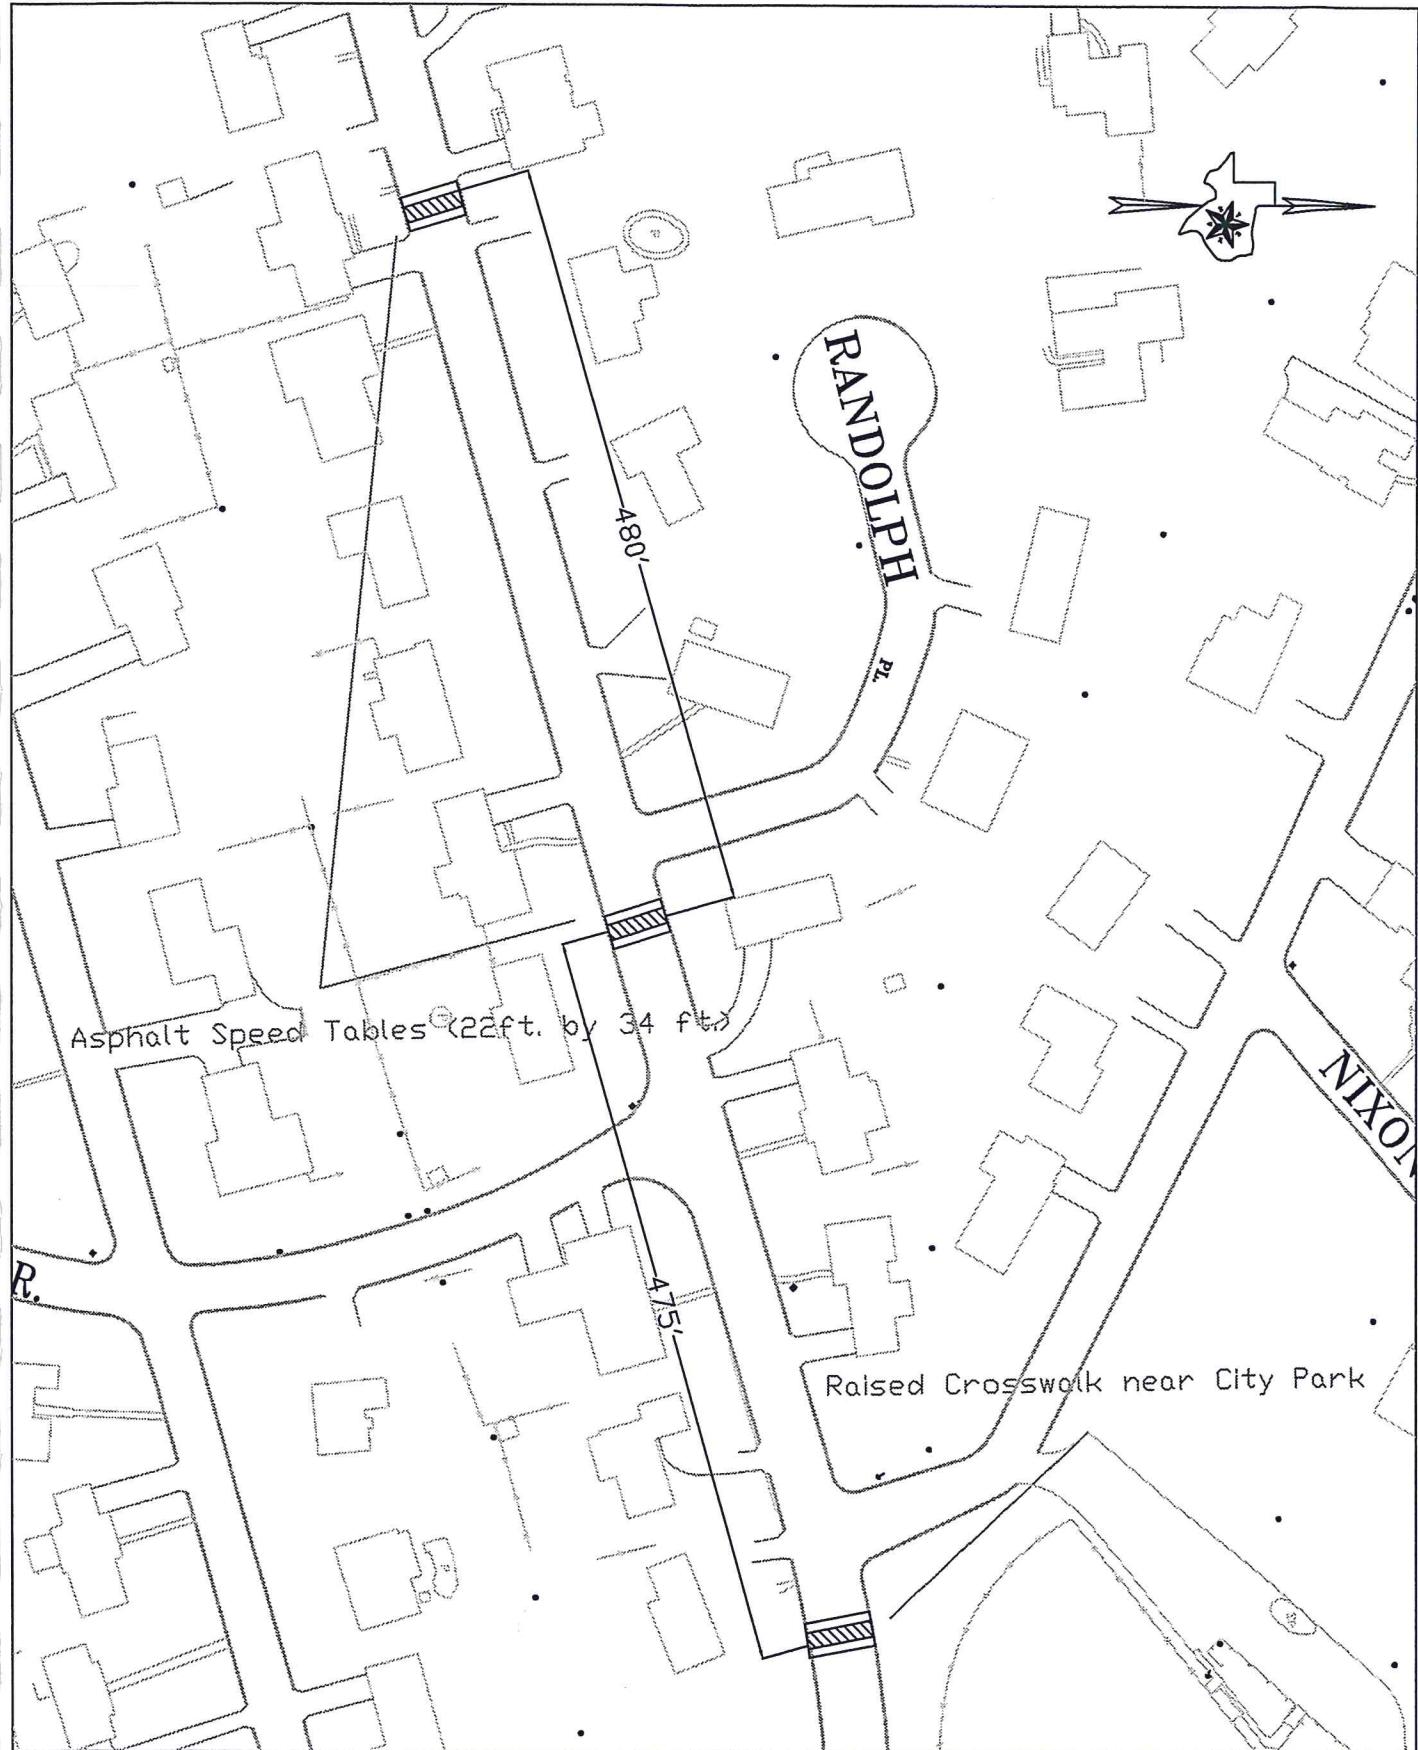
Typical Spacing between Speed Tables on Rollingwood Drive
